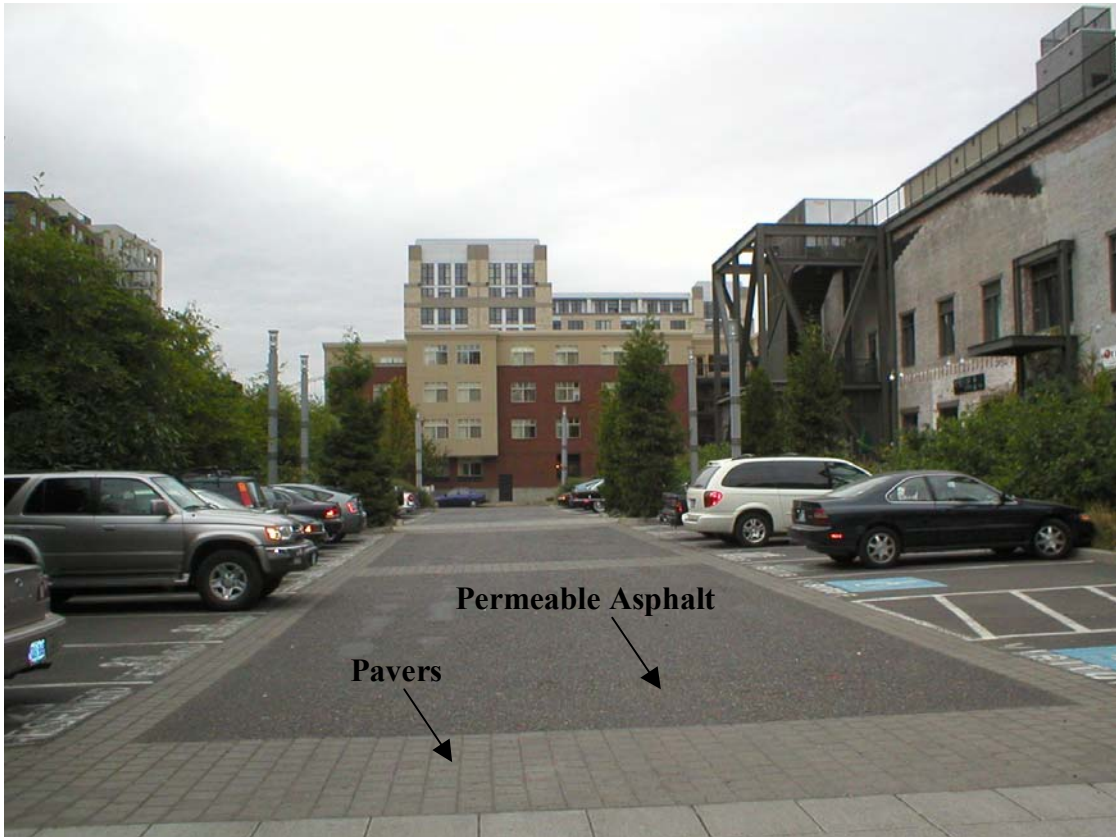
Ecotrust Parking Lot (Photo credit: Author)
